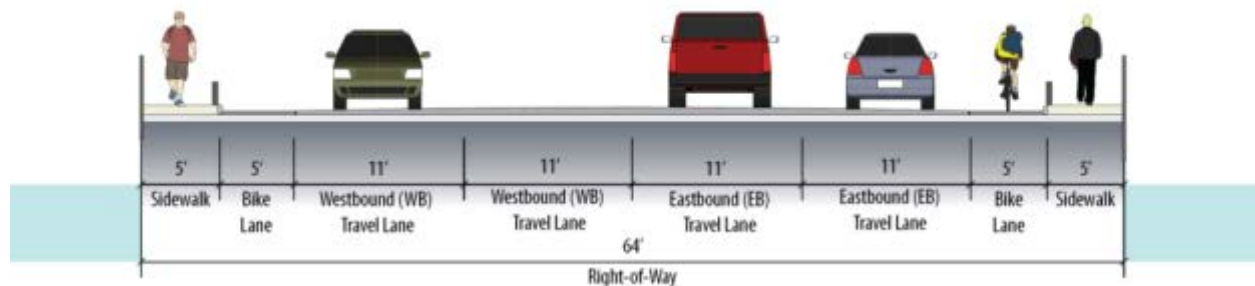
Long-term Alternative Bridge Improvement Lane Configuration
